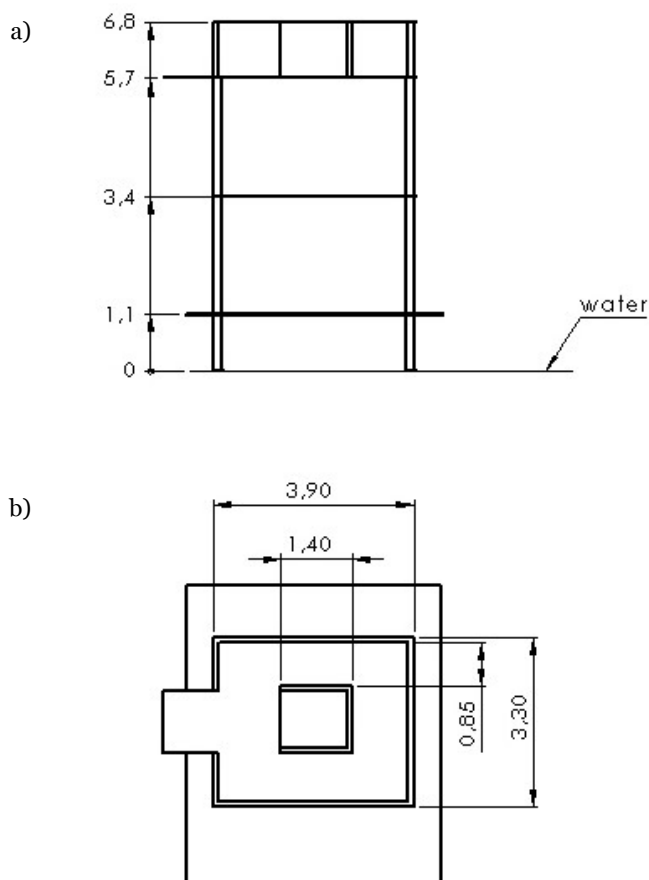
Dimensions of the diving platform in metres, a) – front view, b) – top view.
